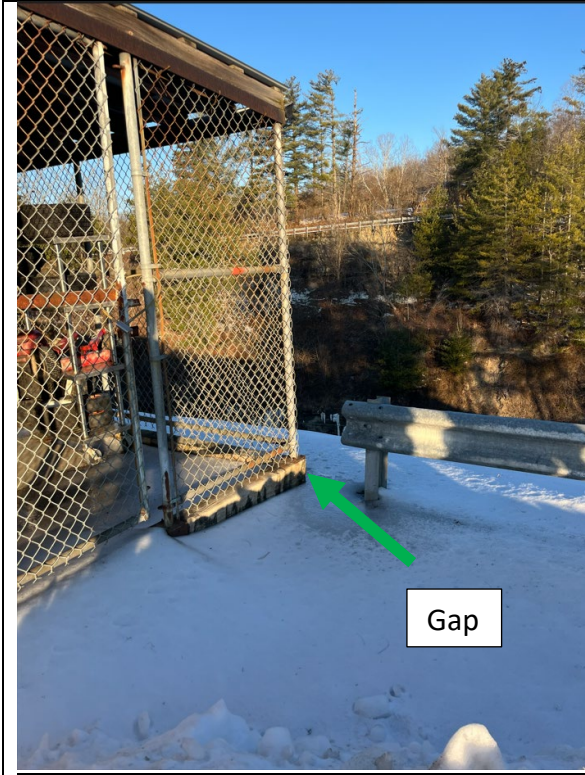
Gap between right front corner of Toxic building and guardrail (day). Photo taken 2/10/2026.
